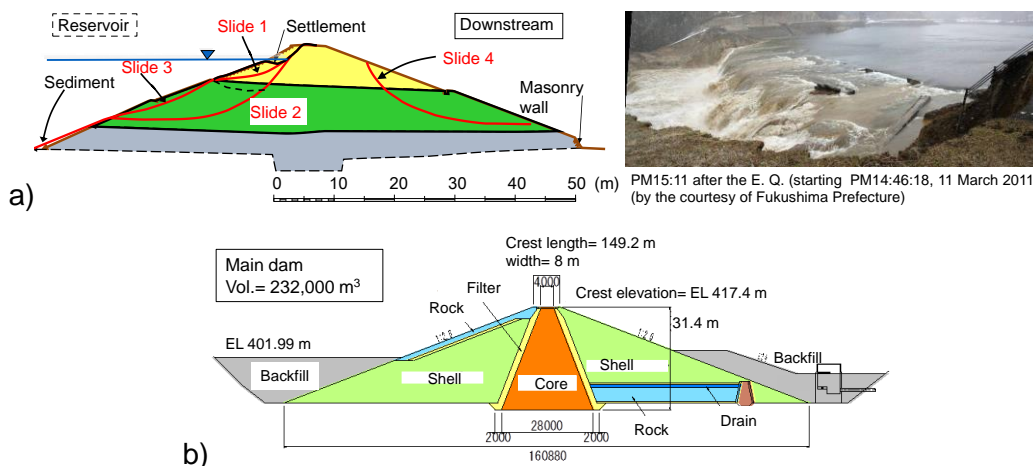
Fujinuma dam, Fukushima Pref. Japan: a) collapsed; & b) reconstructed.
